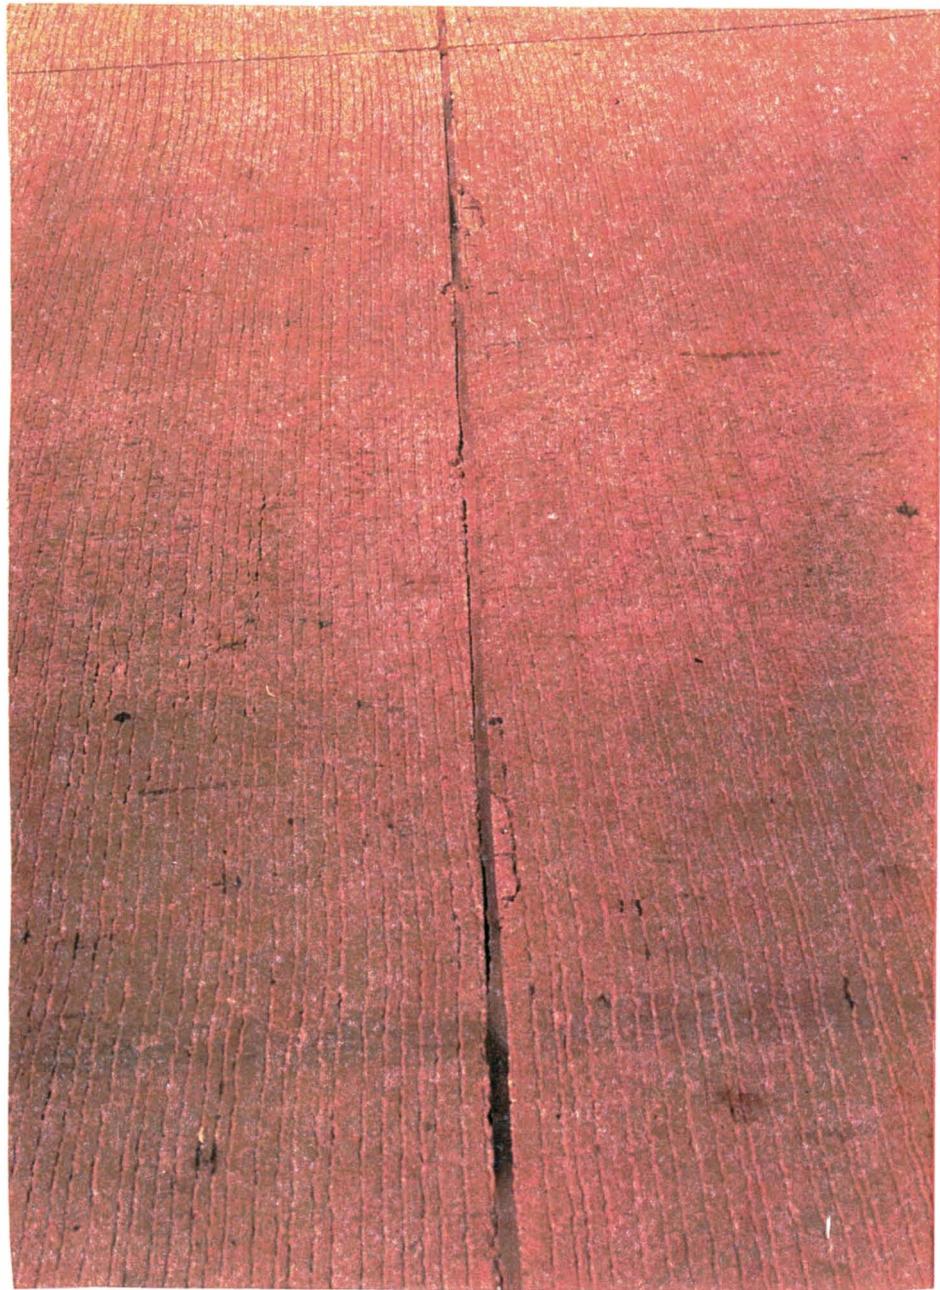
U - Shaped Cracks in Wheel Paths, Located at Tenth Joint From East End
